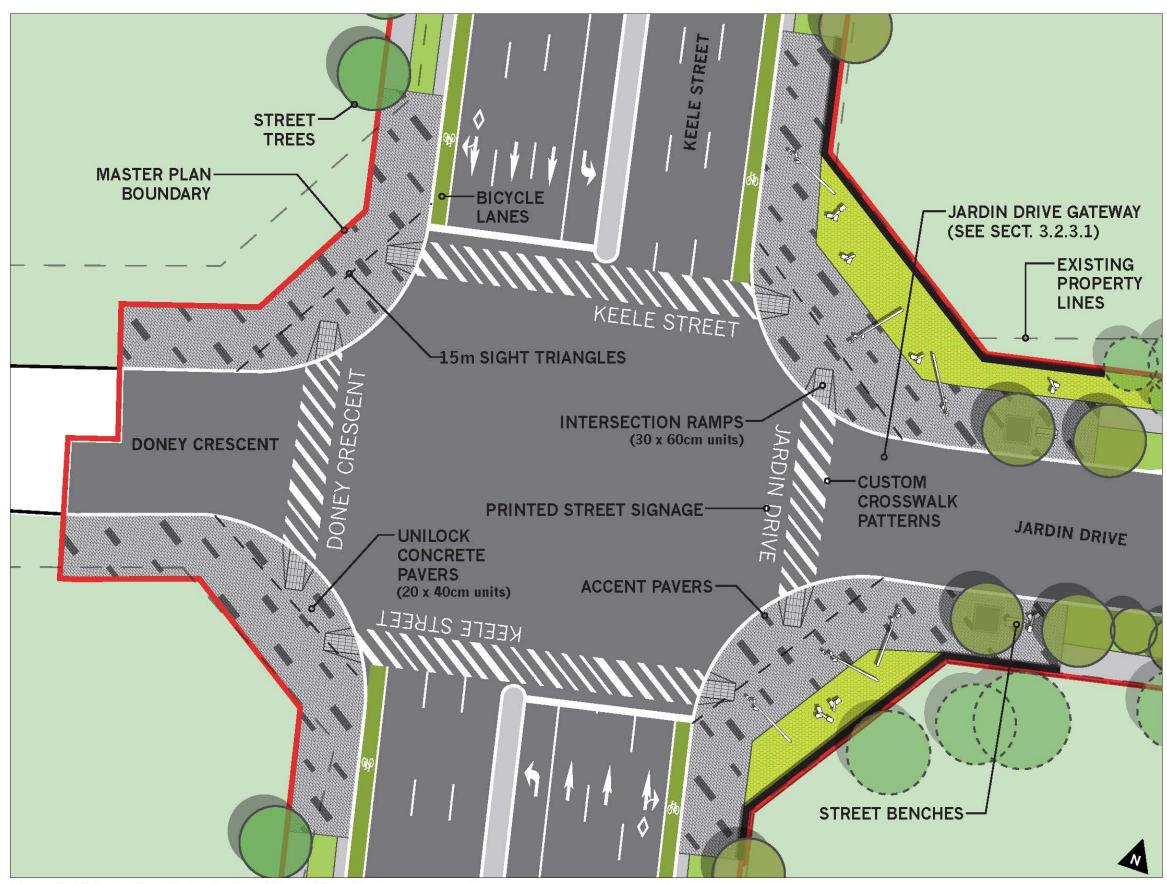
Keele Street & Jardin Drive Intersection streetscape concept.
